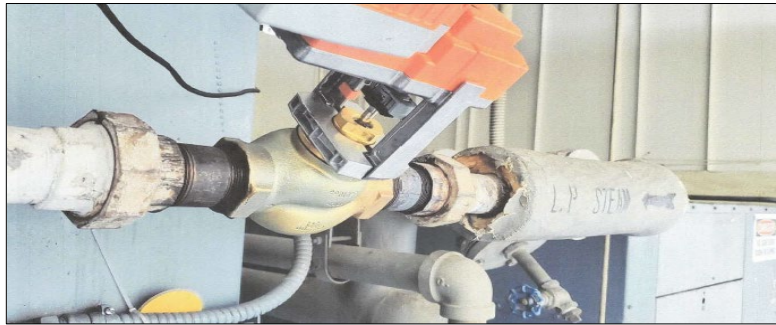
Damaged Asbestos-Containing Cement Pipe Wrapping in Mechanical Room 6607⁵
